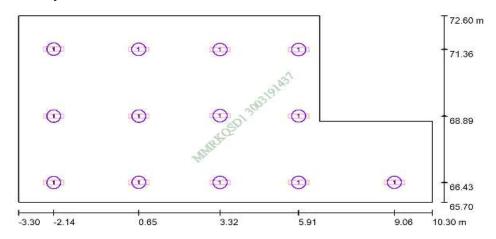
Floor Plan View of Speech Processing Laboratory
